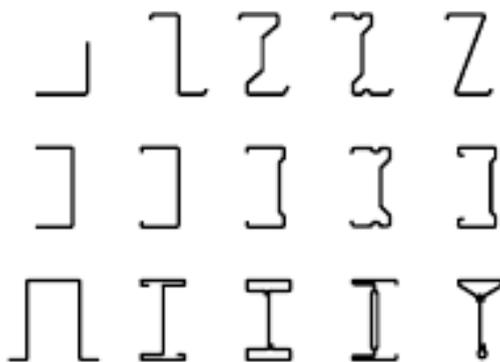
Typical cross-sectional shapes of single open CFS sections
